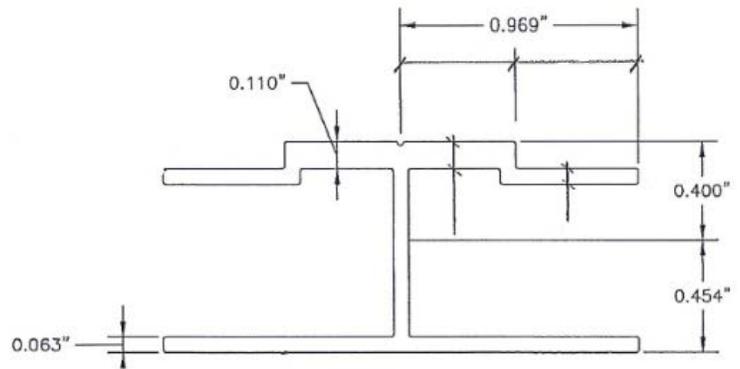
PANEL STIFFENER PROFILE AND PLACEMENT ON PANELS
